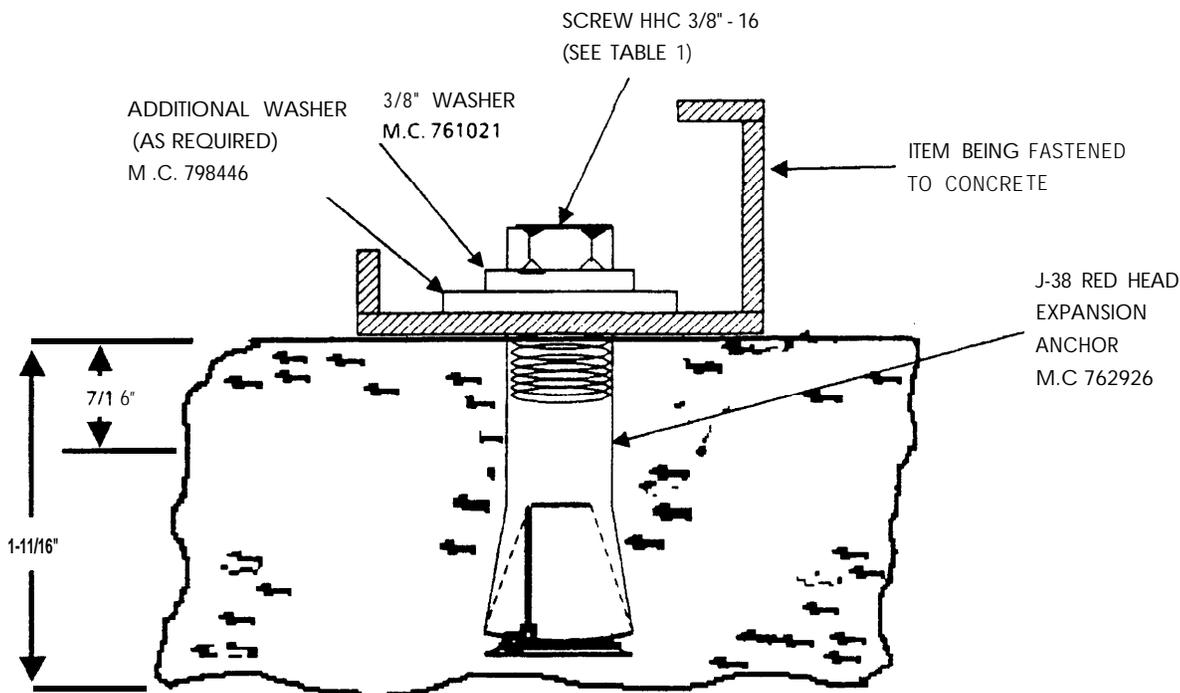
J-38 Red Head (MC-762926) Expansion Anchor Fastening.
